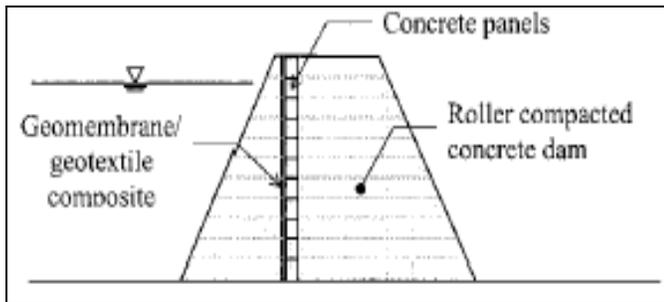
(B): Geomembrane Waterproofing Of Roller Compacted Concrete Dam
